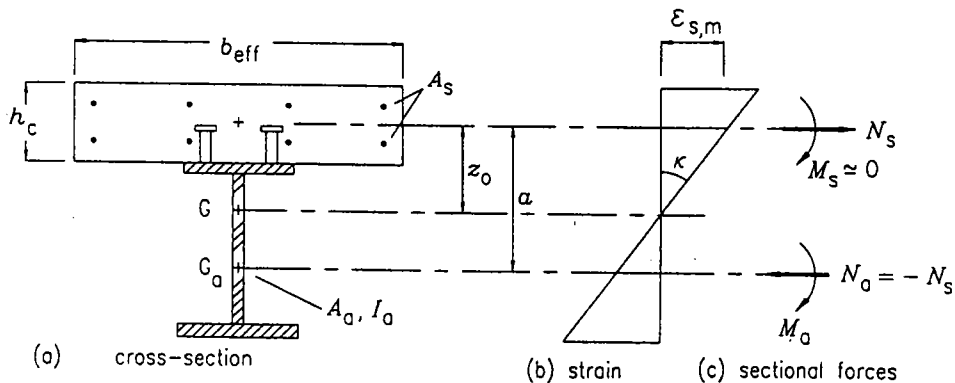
Cross-section of composite beam in hogging bending, at initial cracking of concrete
